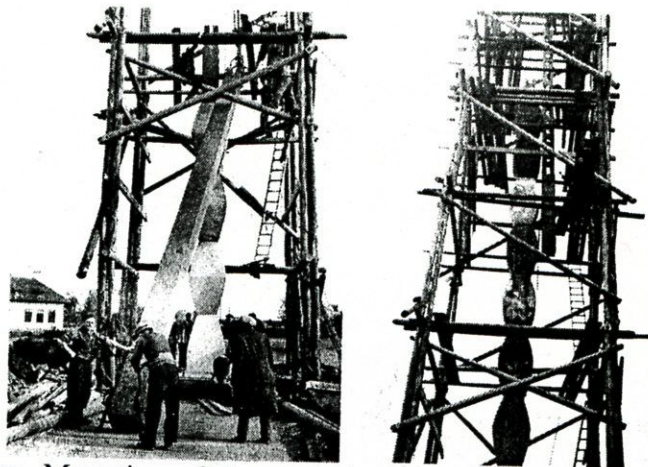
Endless Column. Mounting of the second and third core section (1937). Note the square welded tube structure (left) and the open structure (profiles with welded plates) (right).
